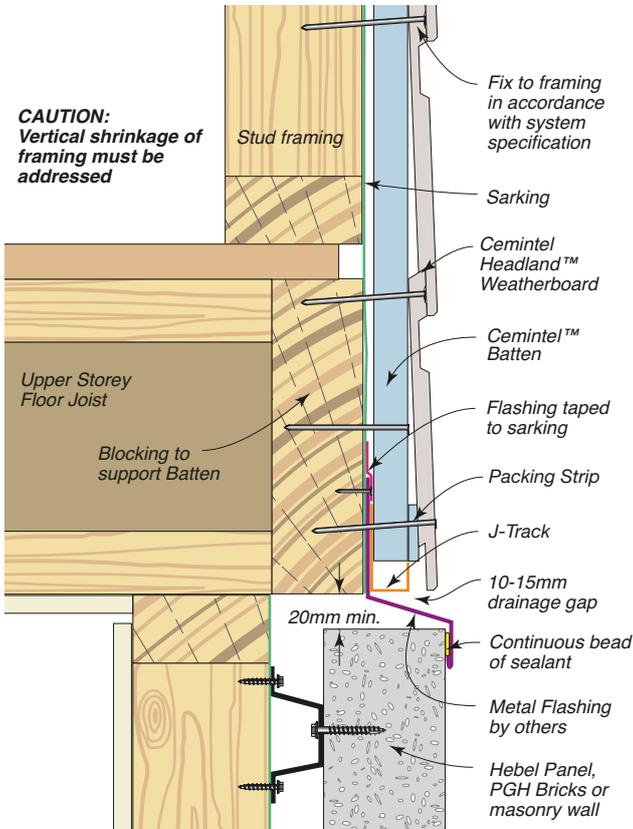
Second Storey Junction with Masonry, Brick Veneer or Hebel Panels
